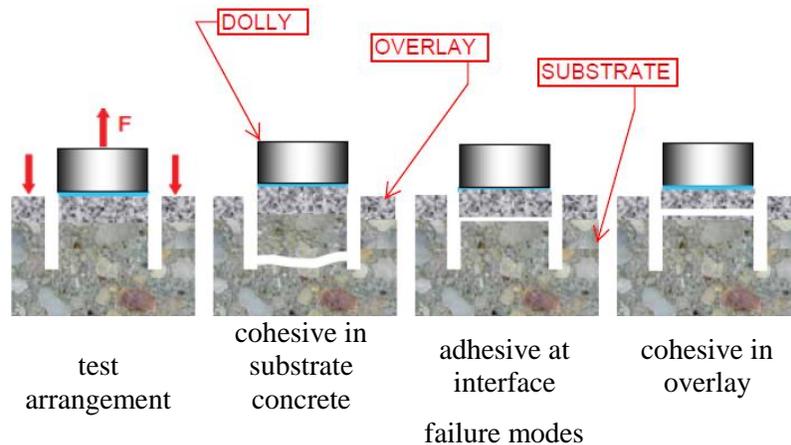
Bond strength pull-off test (adopted from Germann Instruments Inc.).
